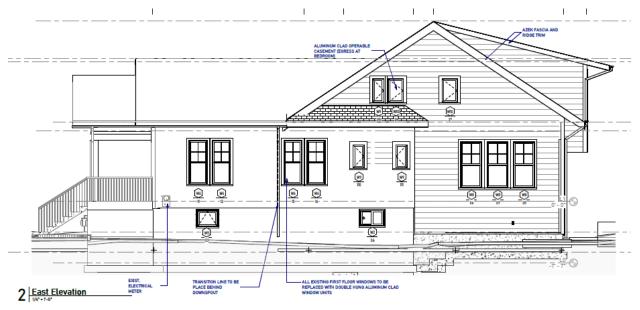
Revised addition, inset by 1' (one foot) from the historic wall plane.
